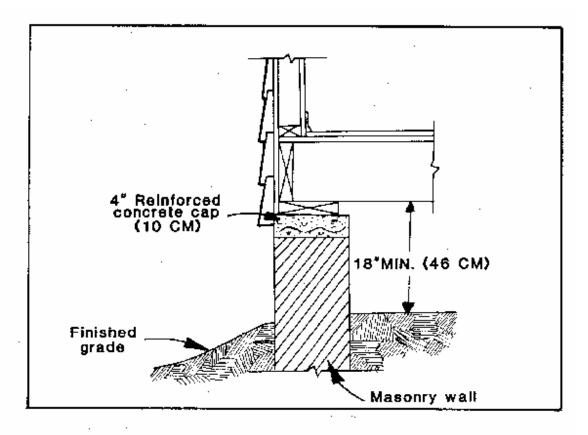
Reinforced Poured Concrete on Masonry Walls or Piers. (This technique prevents hidden termite attack. A minimum clearance of 18 inches under floor joists allows inspection for termite tubes or possible cracks in the cap.)
